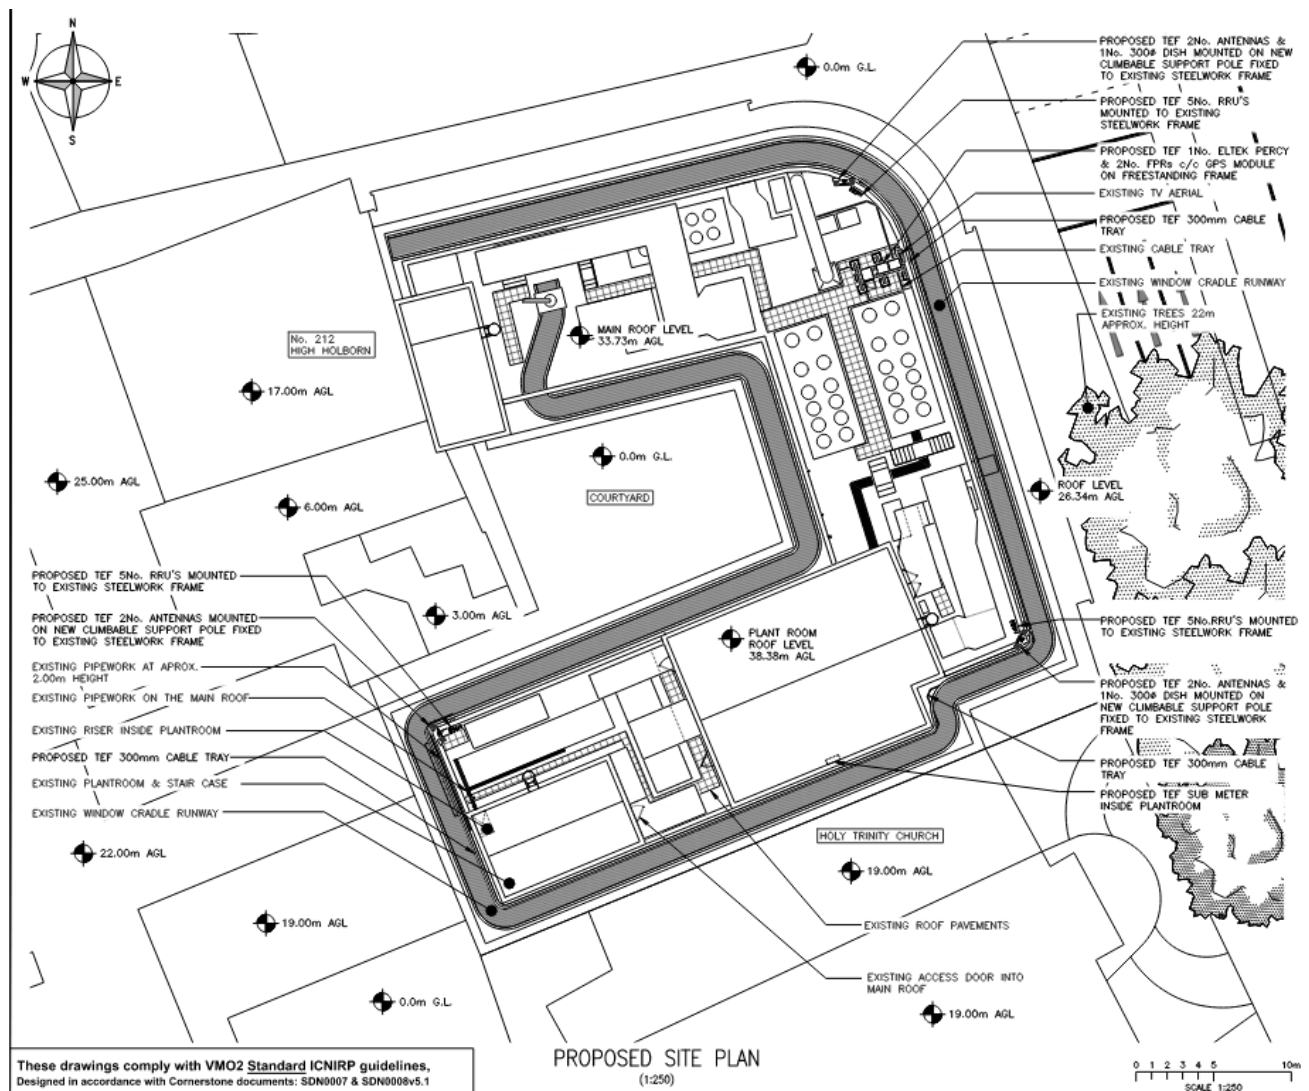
(above): Proposed site plan (source: Proposed drawings)
